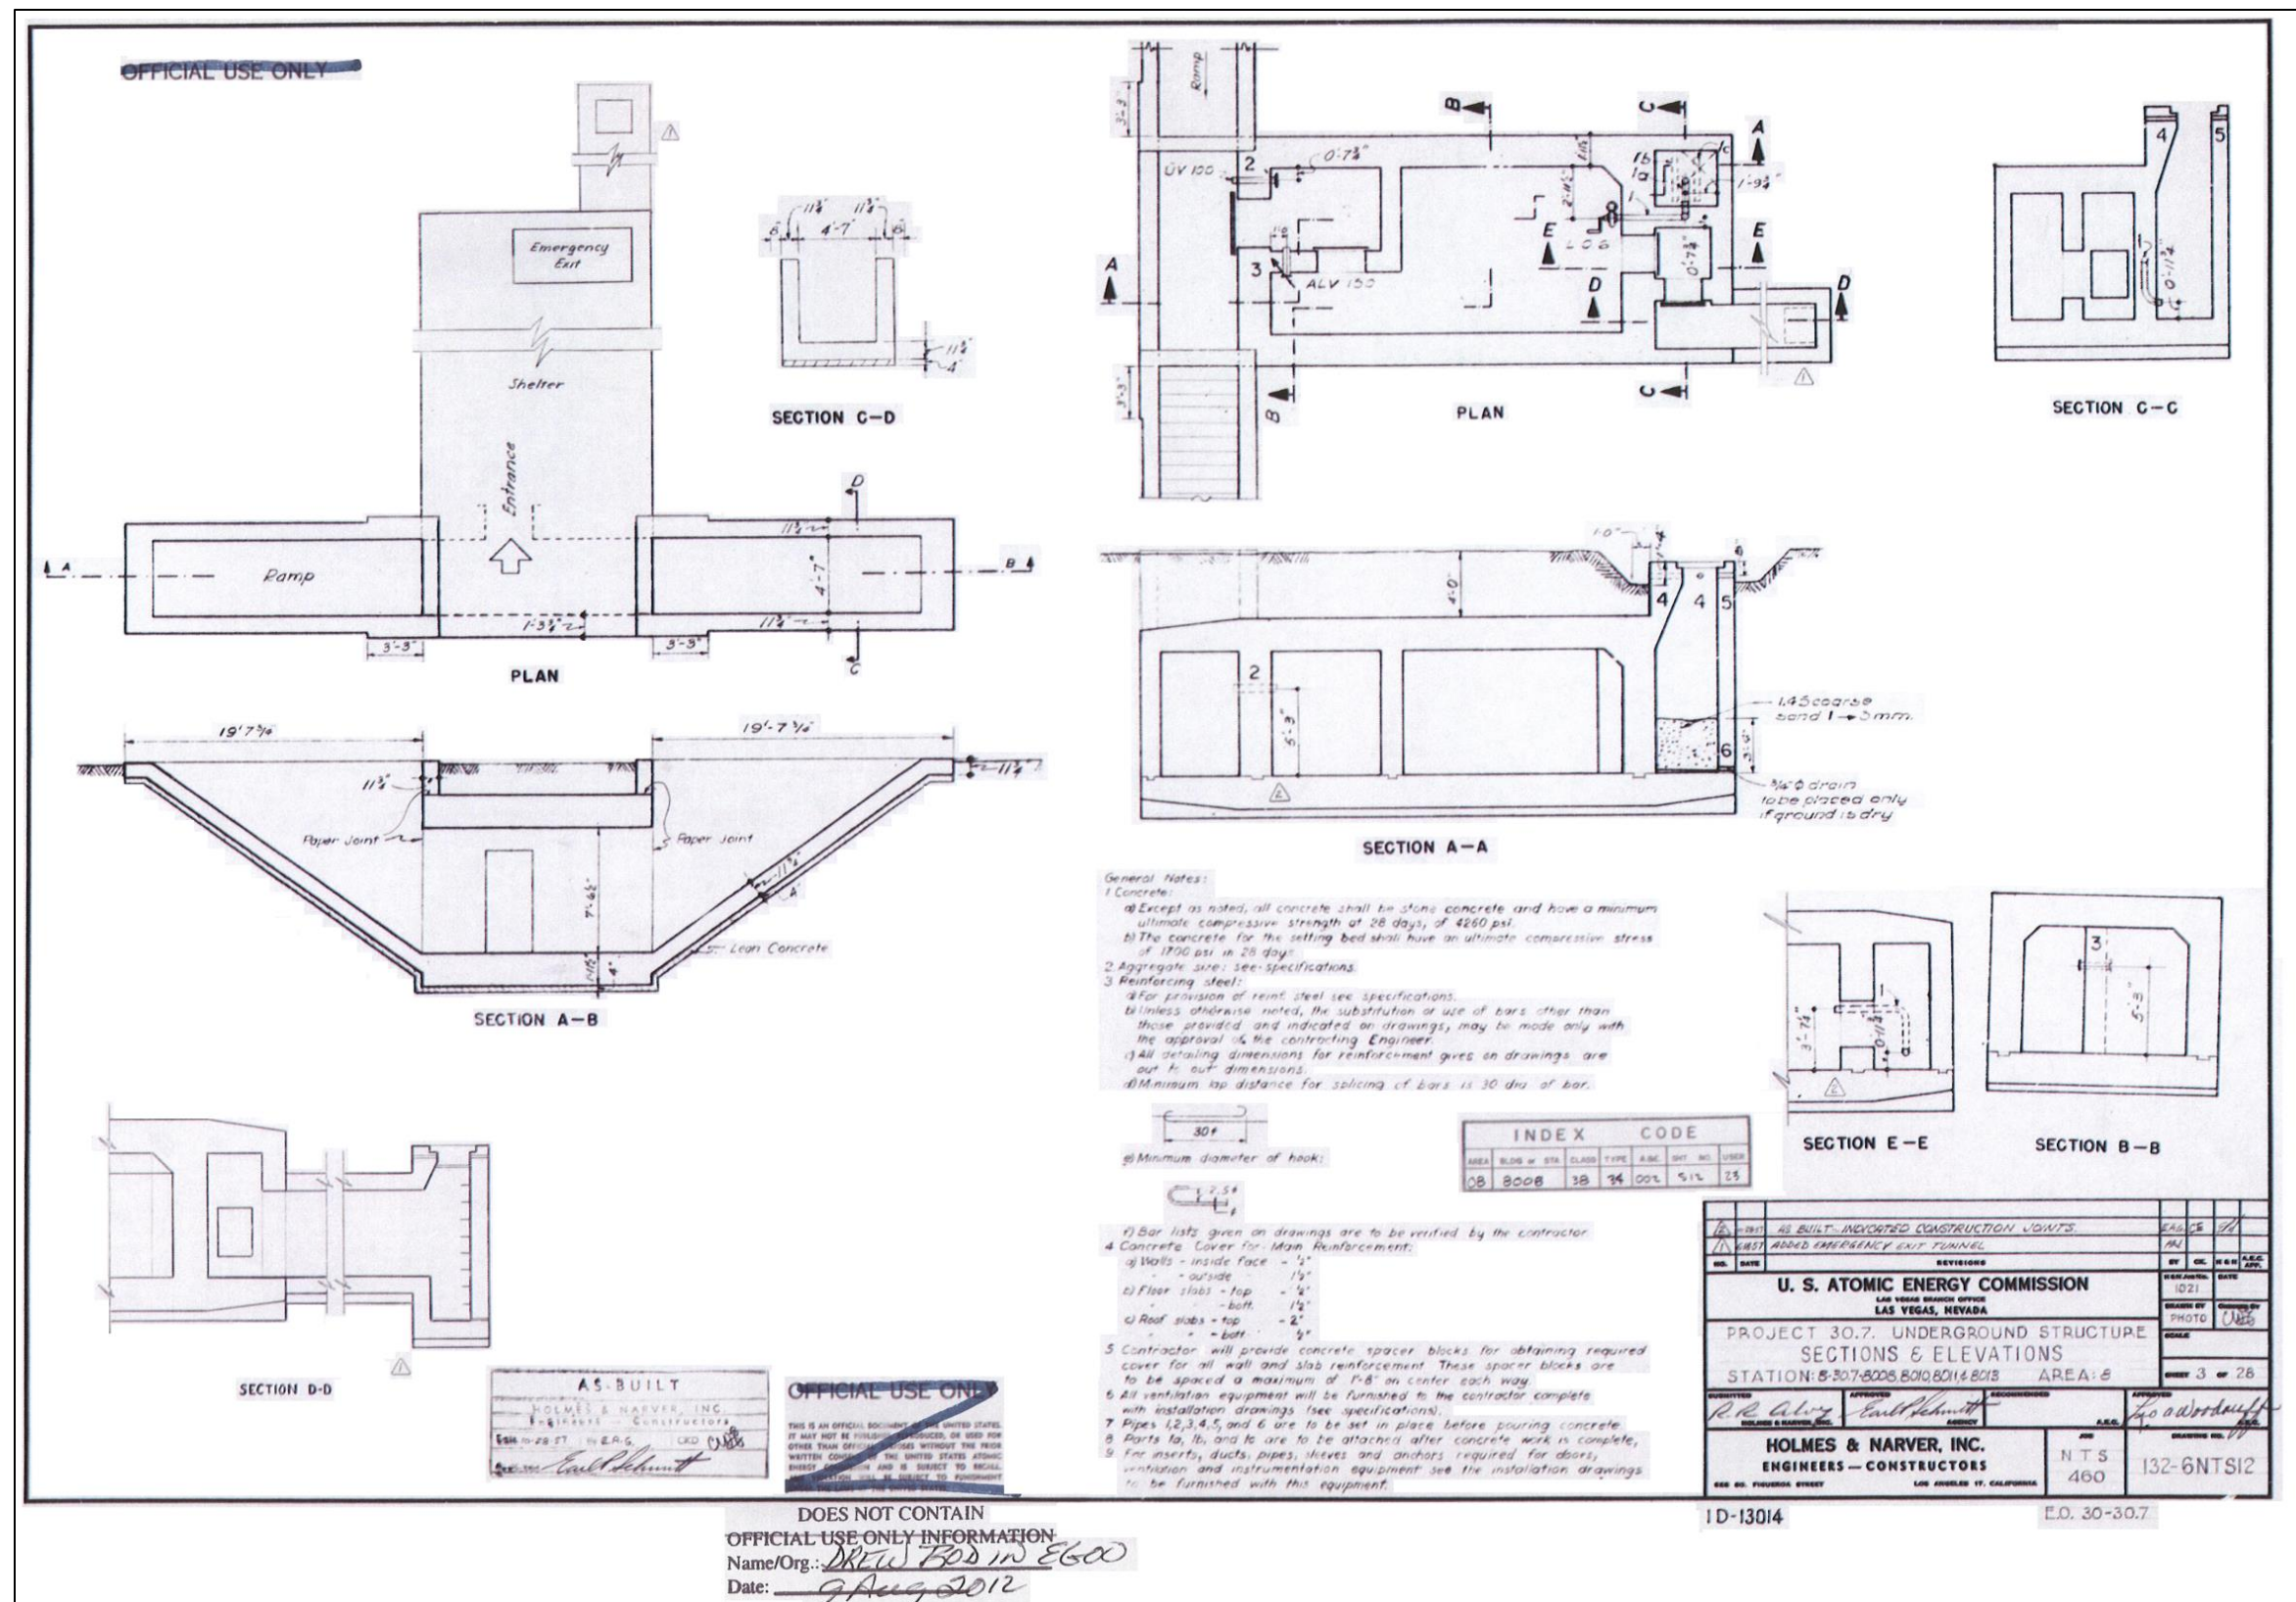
S911, S912, S914, S916, German underground personnel shelters RAa, RAb, RAc, RAD, sections and elevations.
